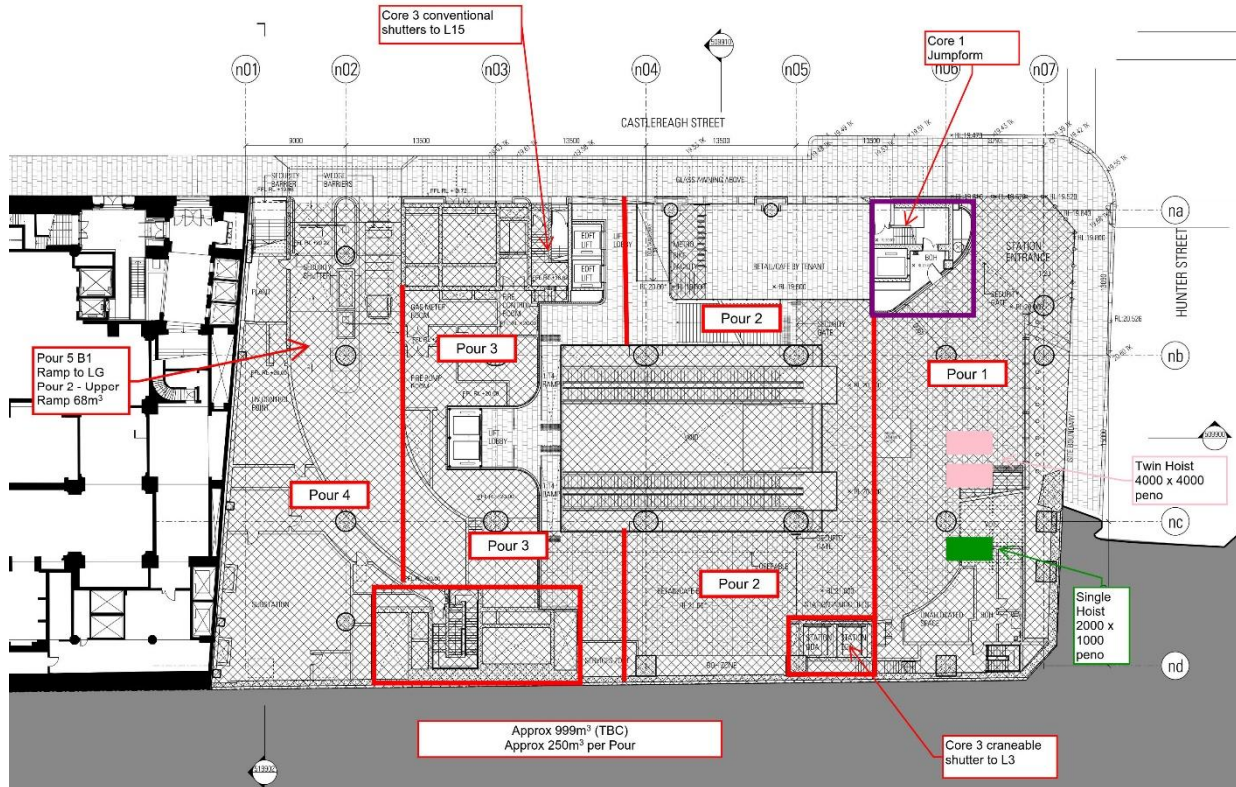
North Building – LG Level illustrating 4 Main Cores
